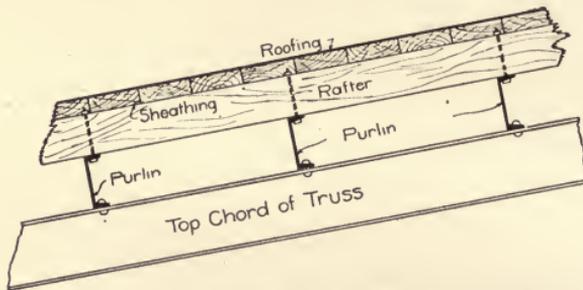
Roof Construction in which Rafters Supporting the Sheathing are Laid on the Purlins which Connect the Trusses.
